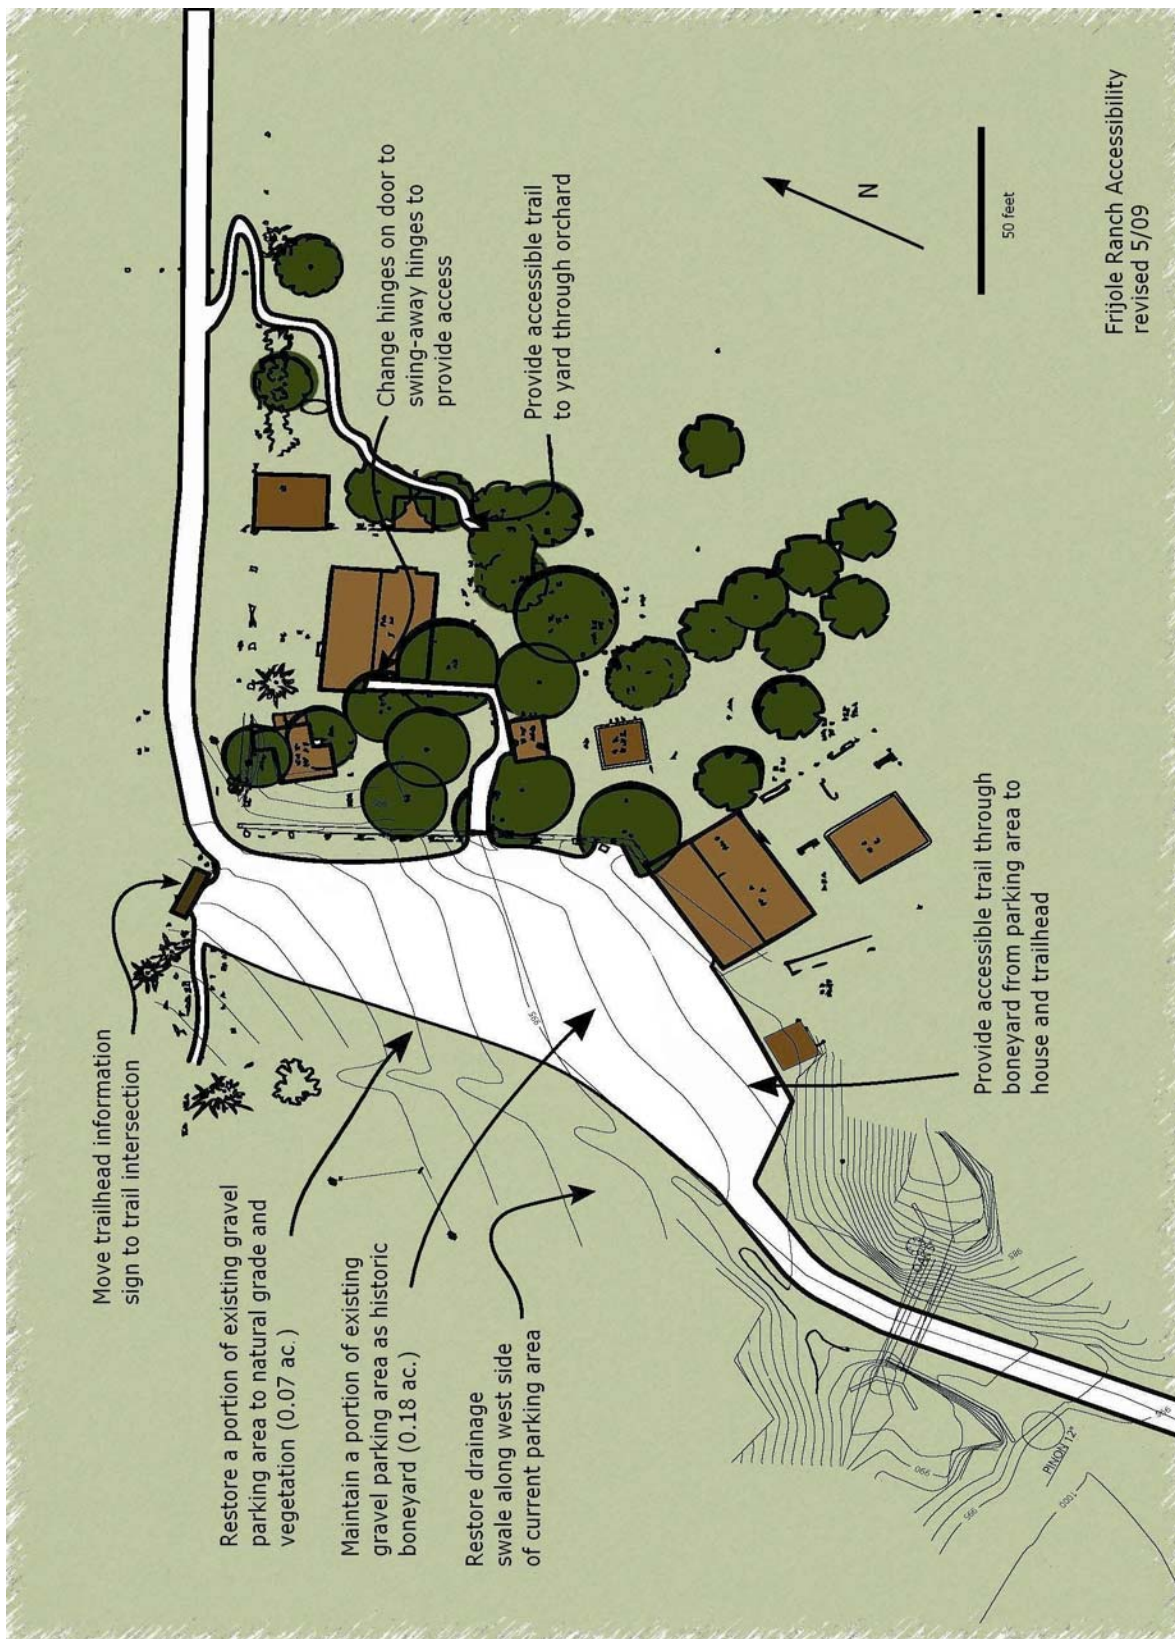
Landscape Architect's proposed design for Frijole Ranch area for Alternative B and C
